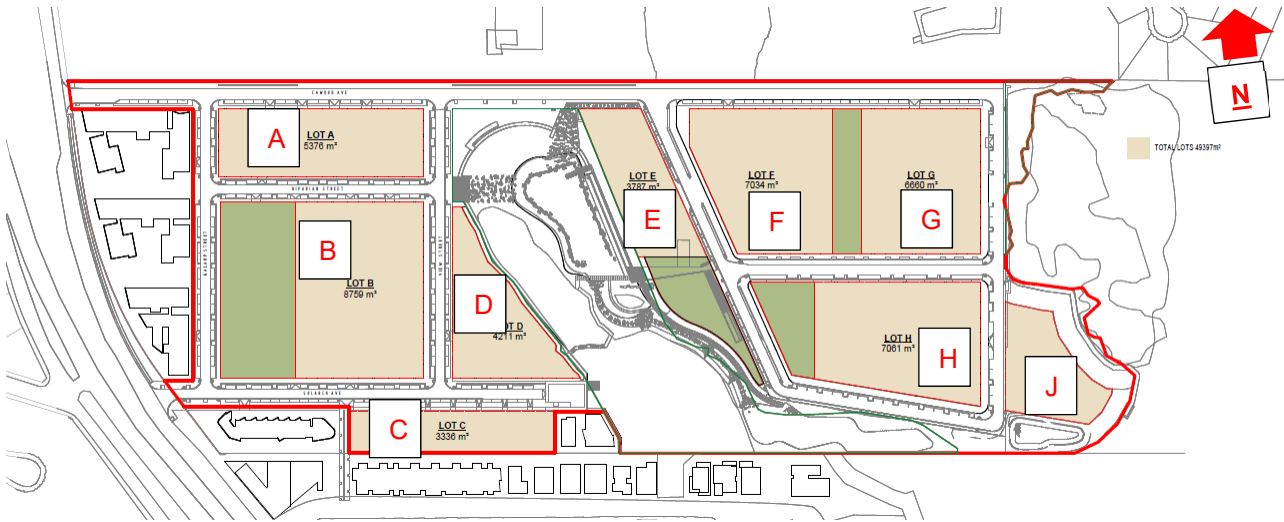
Proposed Lot Plan (Courtesy of SJB)
